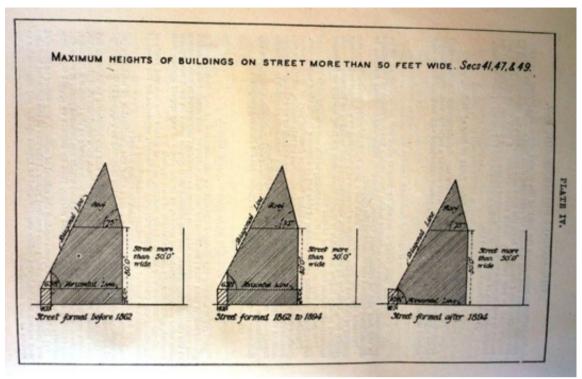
Maximum building height on street more than 50 feet wide (Ibid., Plate IV)
